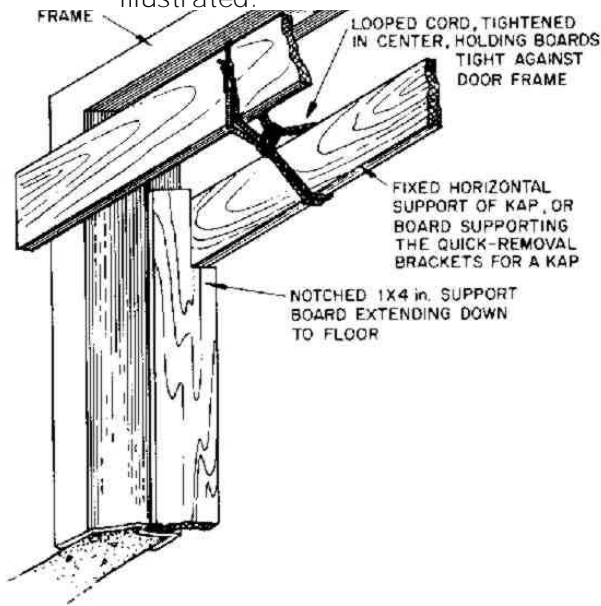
STEEL DOOR FRAME. ORNL DWG 72-6564
